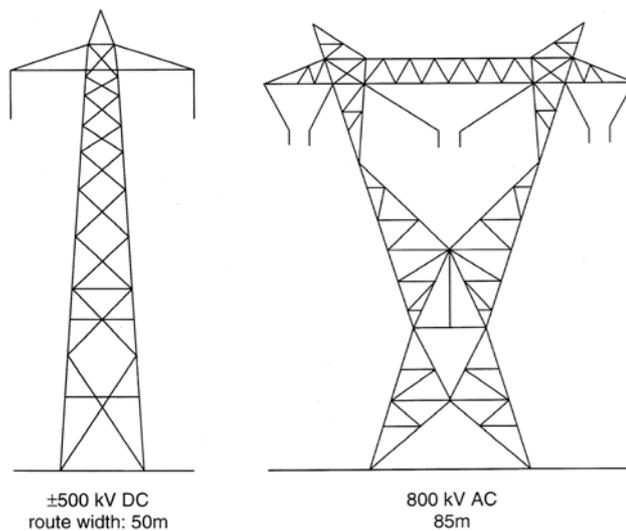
Typical pylon constructions of a HVAC and HVDC overhead line /Arrillaga 1998/.
